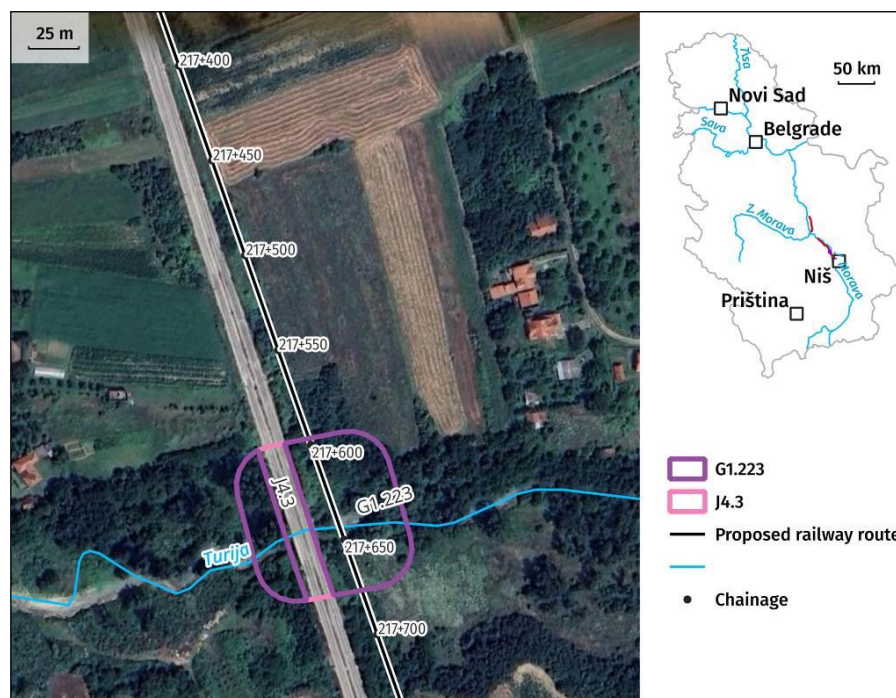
Bridges at km 217+642.36 – Đunis-Trupale subsection
